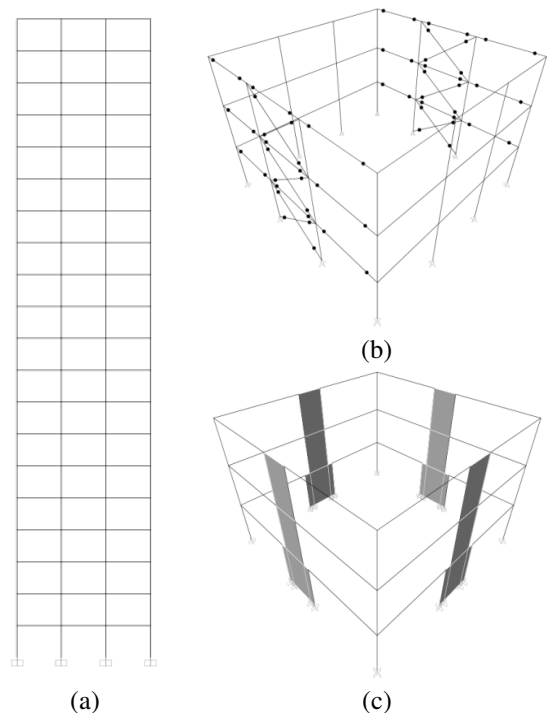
(a) Elevation view of 20 storey steel or concrete moment resisting frames;3D view of (b) 3 storey steel braced frame and, (c) 3 storey concrete reinforced shear wall
